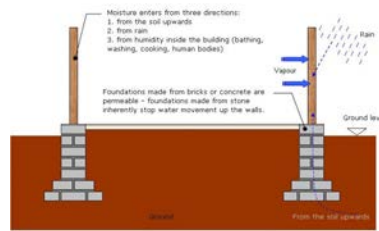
1. Typical foundation detail and lack of considered protection to the timber frame. Traditionally the floor is always raised on stone and it is 1 ft above ground level.
